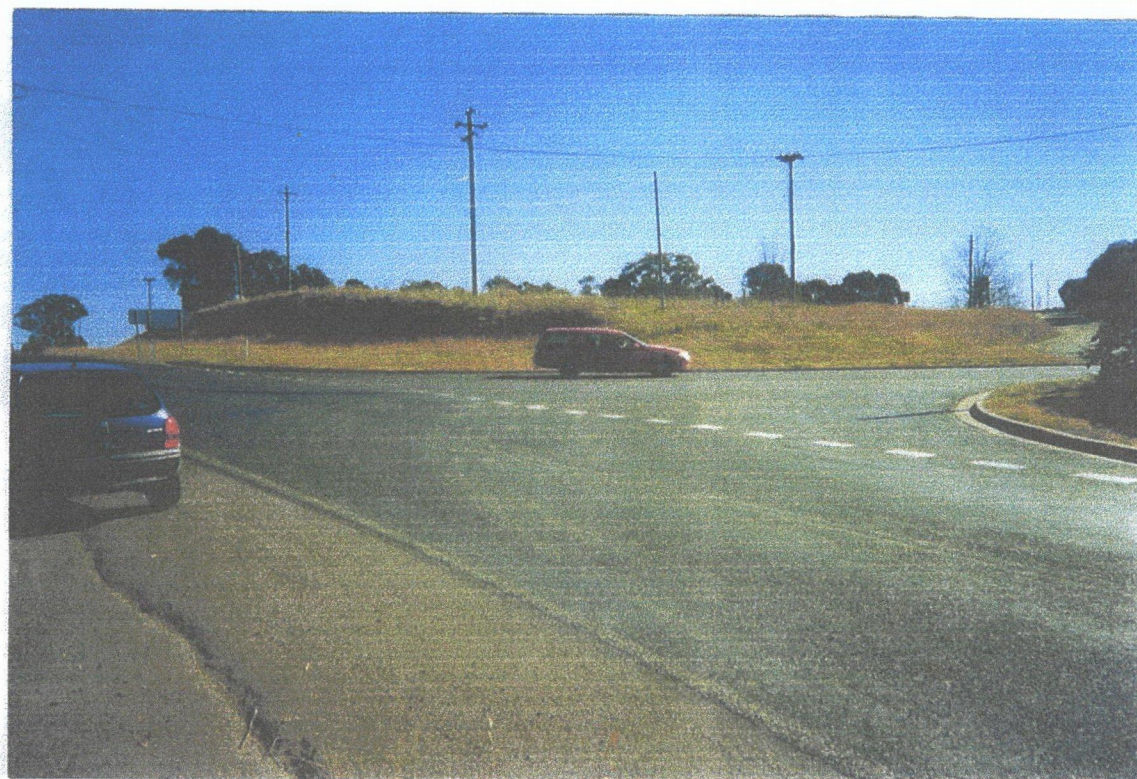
Site 5 - Oaks Estate Road and Railway Street Junction
